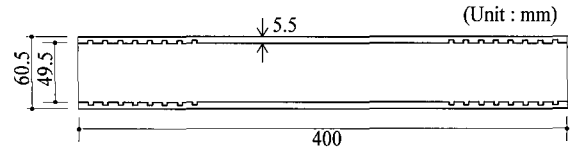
Section of pipe splice sleeve used in test of L.Lee (D25 rebar)
